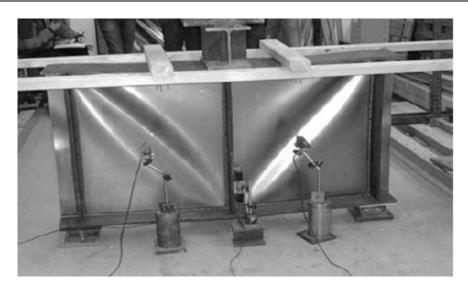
Post-buckling deformation of stiffened plate girder under transverse loading (Mamazizi et al., 2013).
